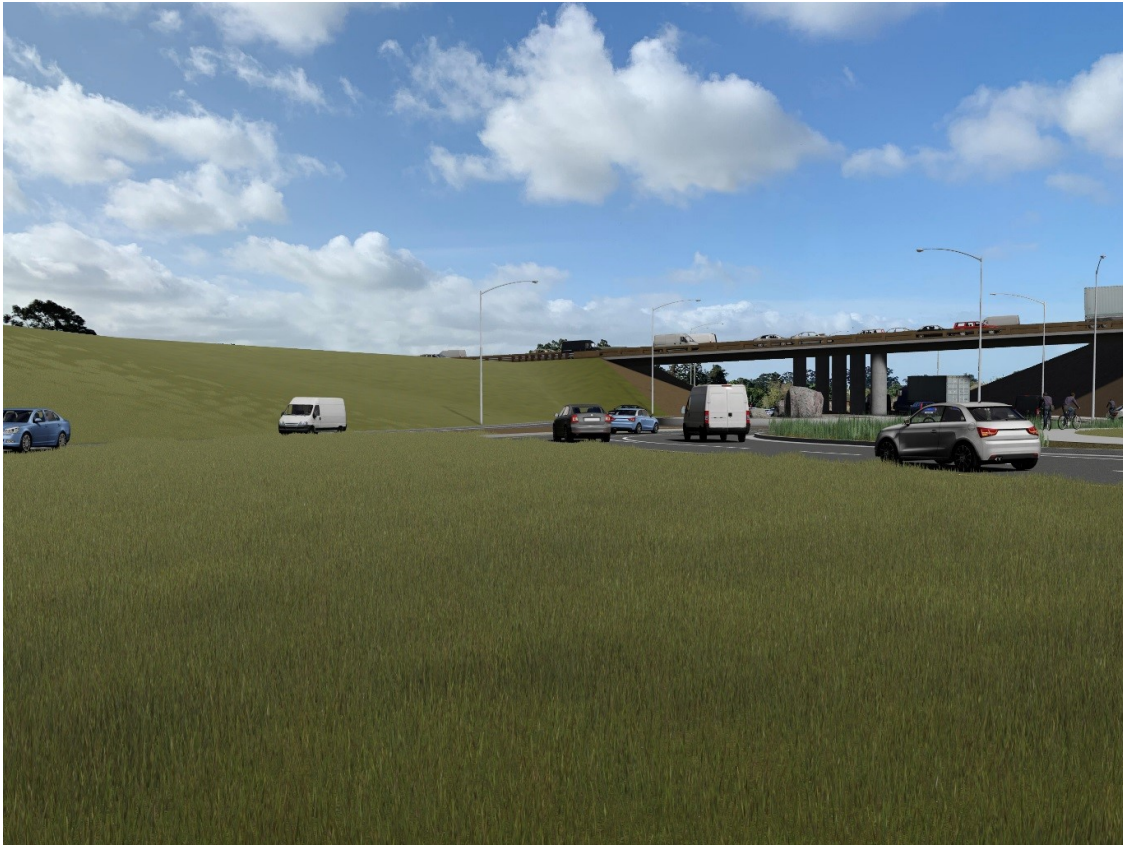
KV 01. Build Alternative Proposed Condition
